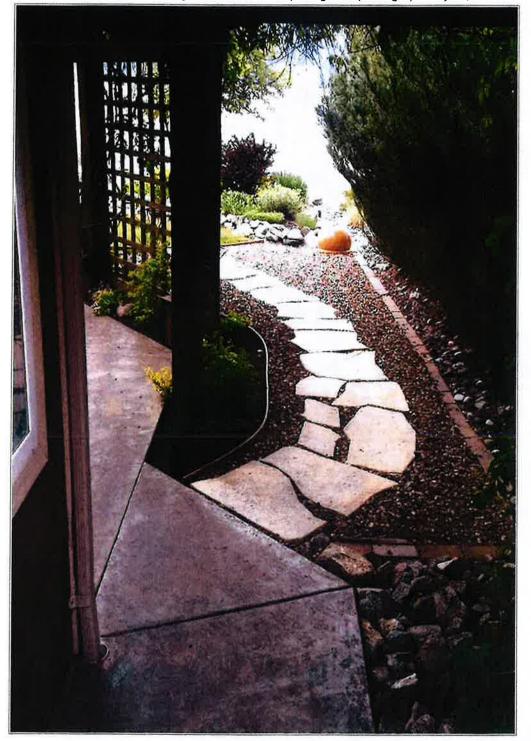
Stepping stone walkway to be recreated as per Figure 3 (looking N) - May 18, 2018.
